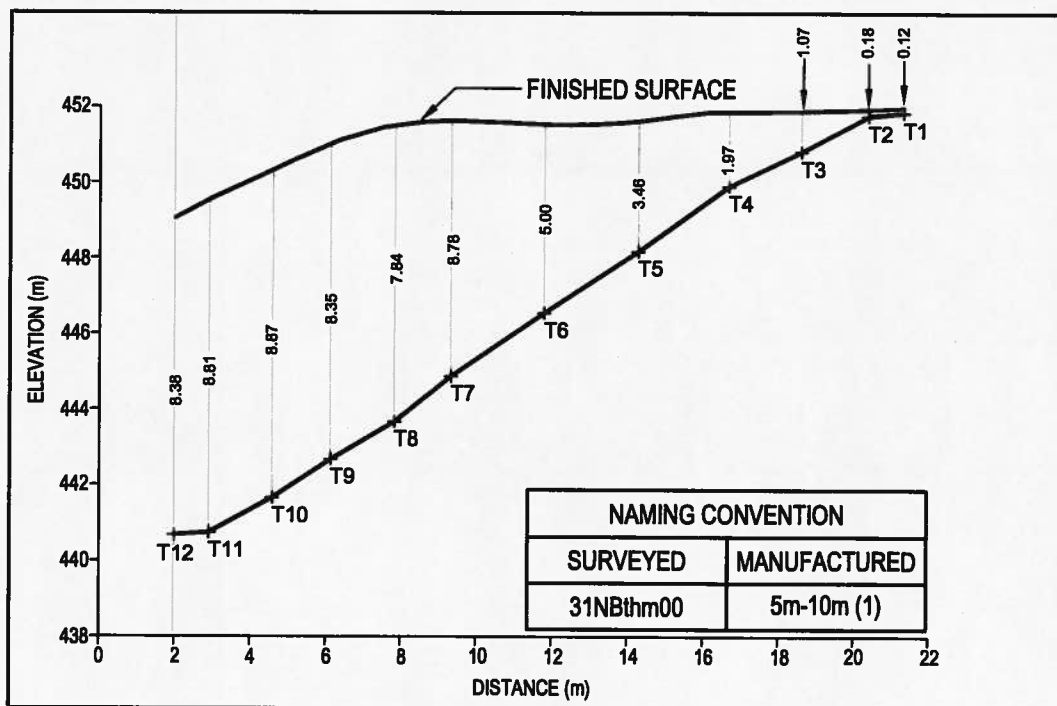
31NBthm00 (5m-10m (1)) - AS MANUFACTURED, PLAN, AND SECTION
